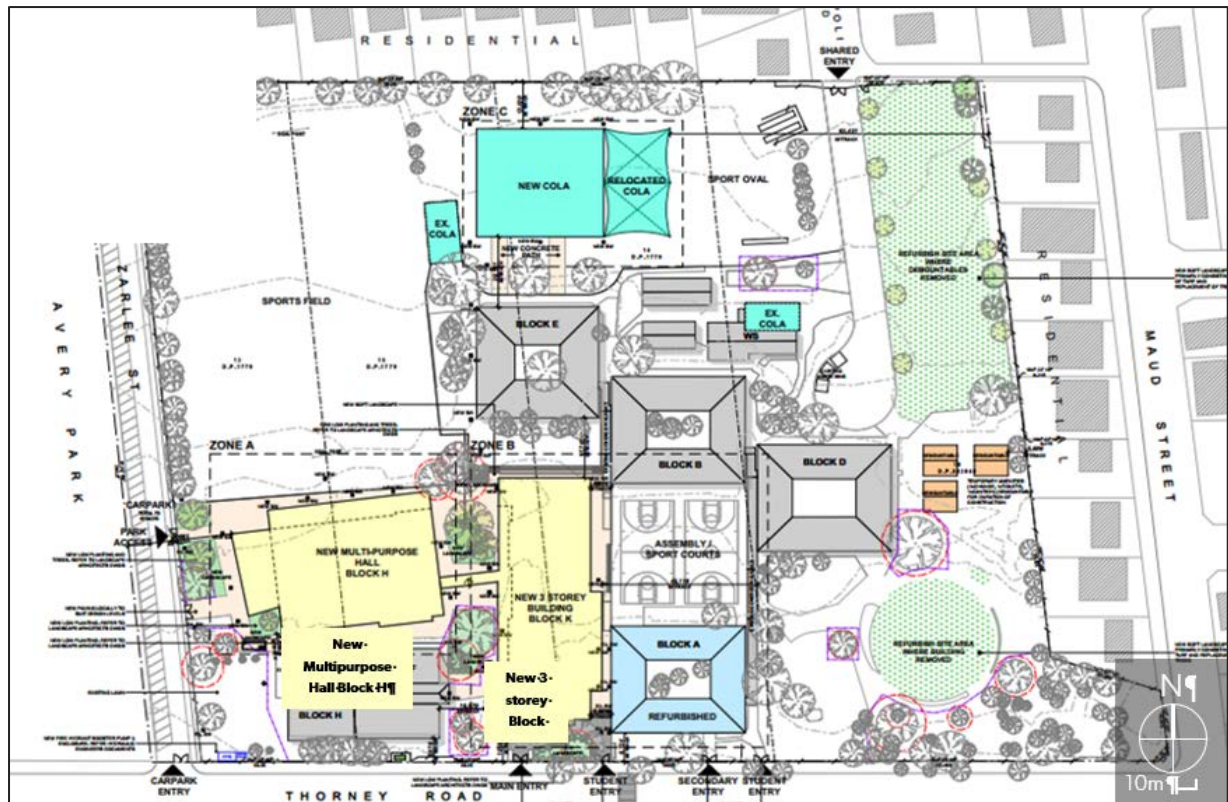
| Approved site layout (Source: Department's original assessment report 2018)
